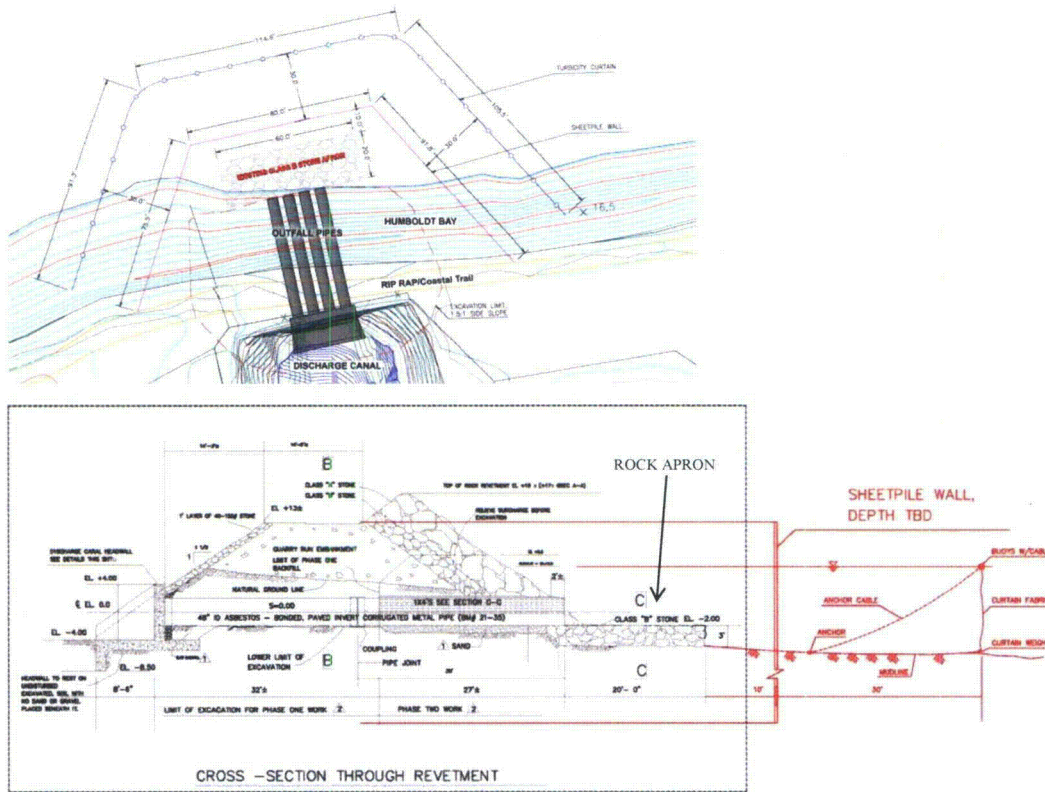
Plan view and cross-section of proposed sheet pile wall installation in Humboldt Bay. Source: Adapted from Parsons 2013.
